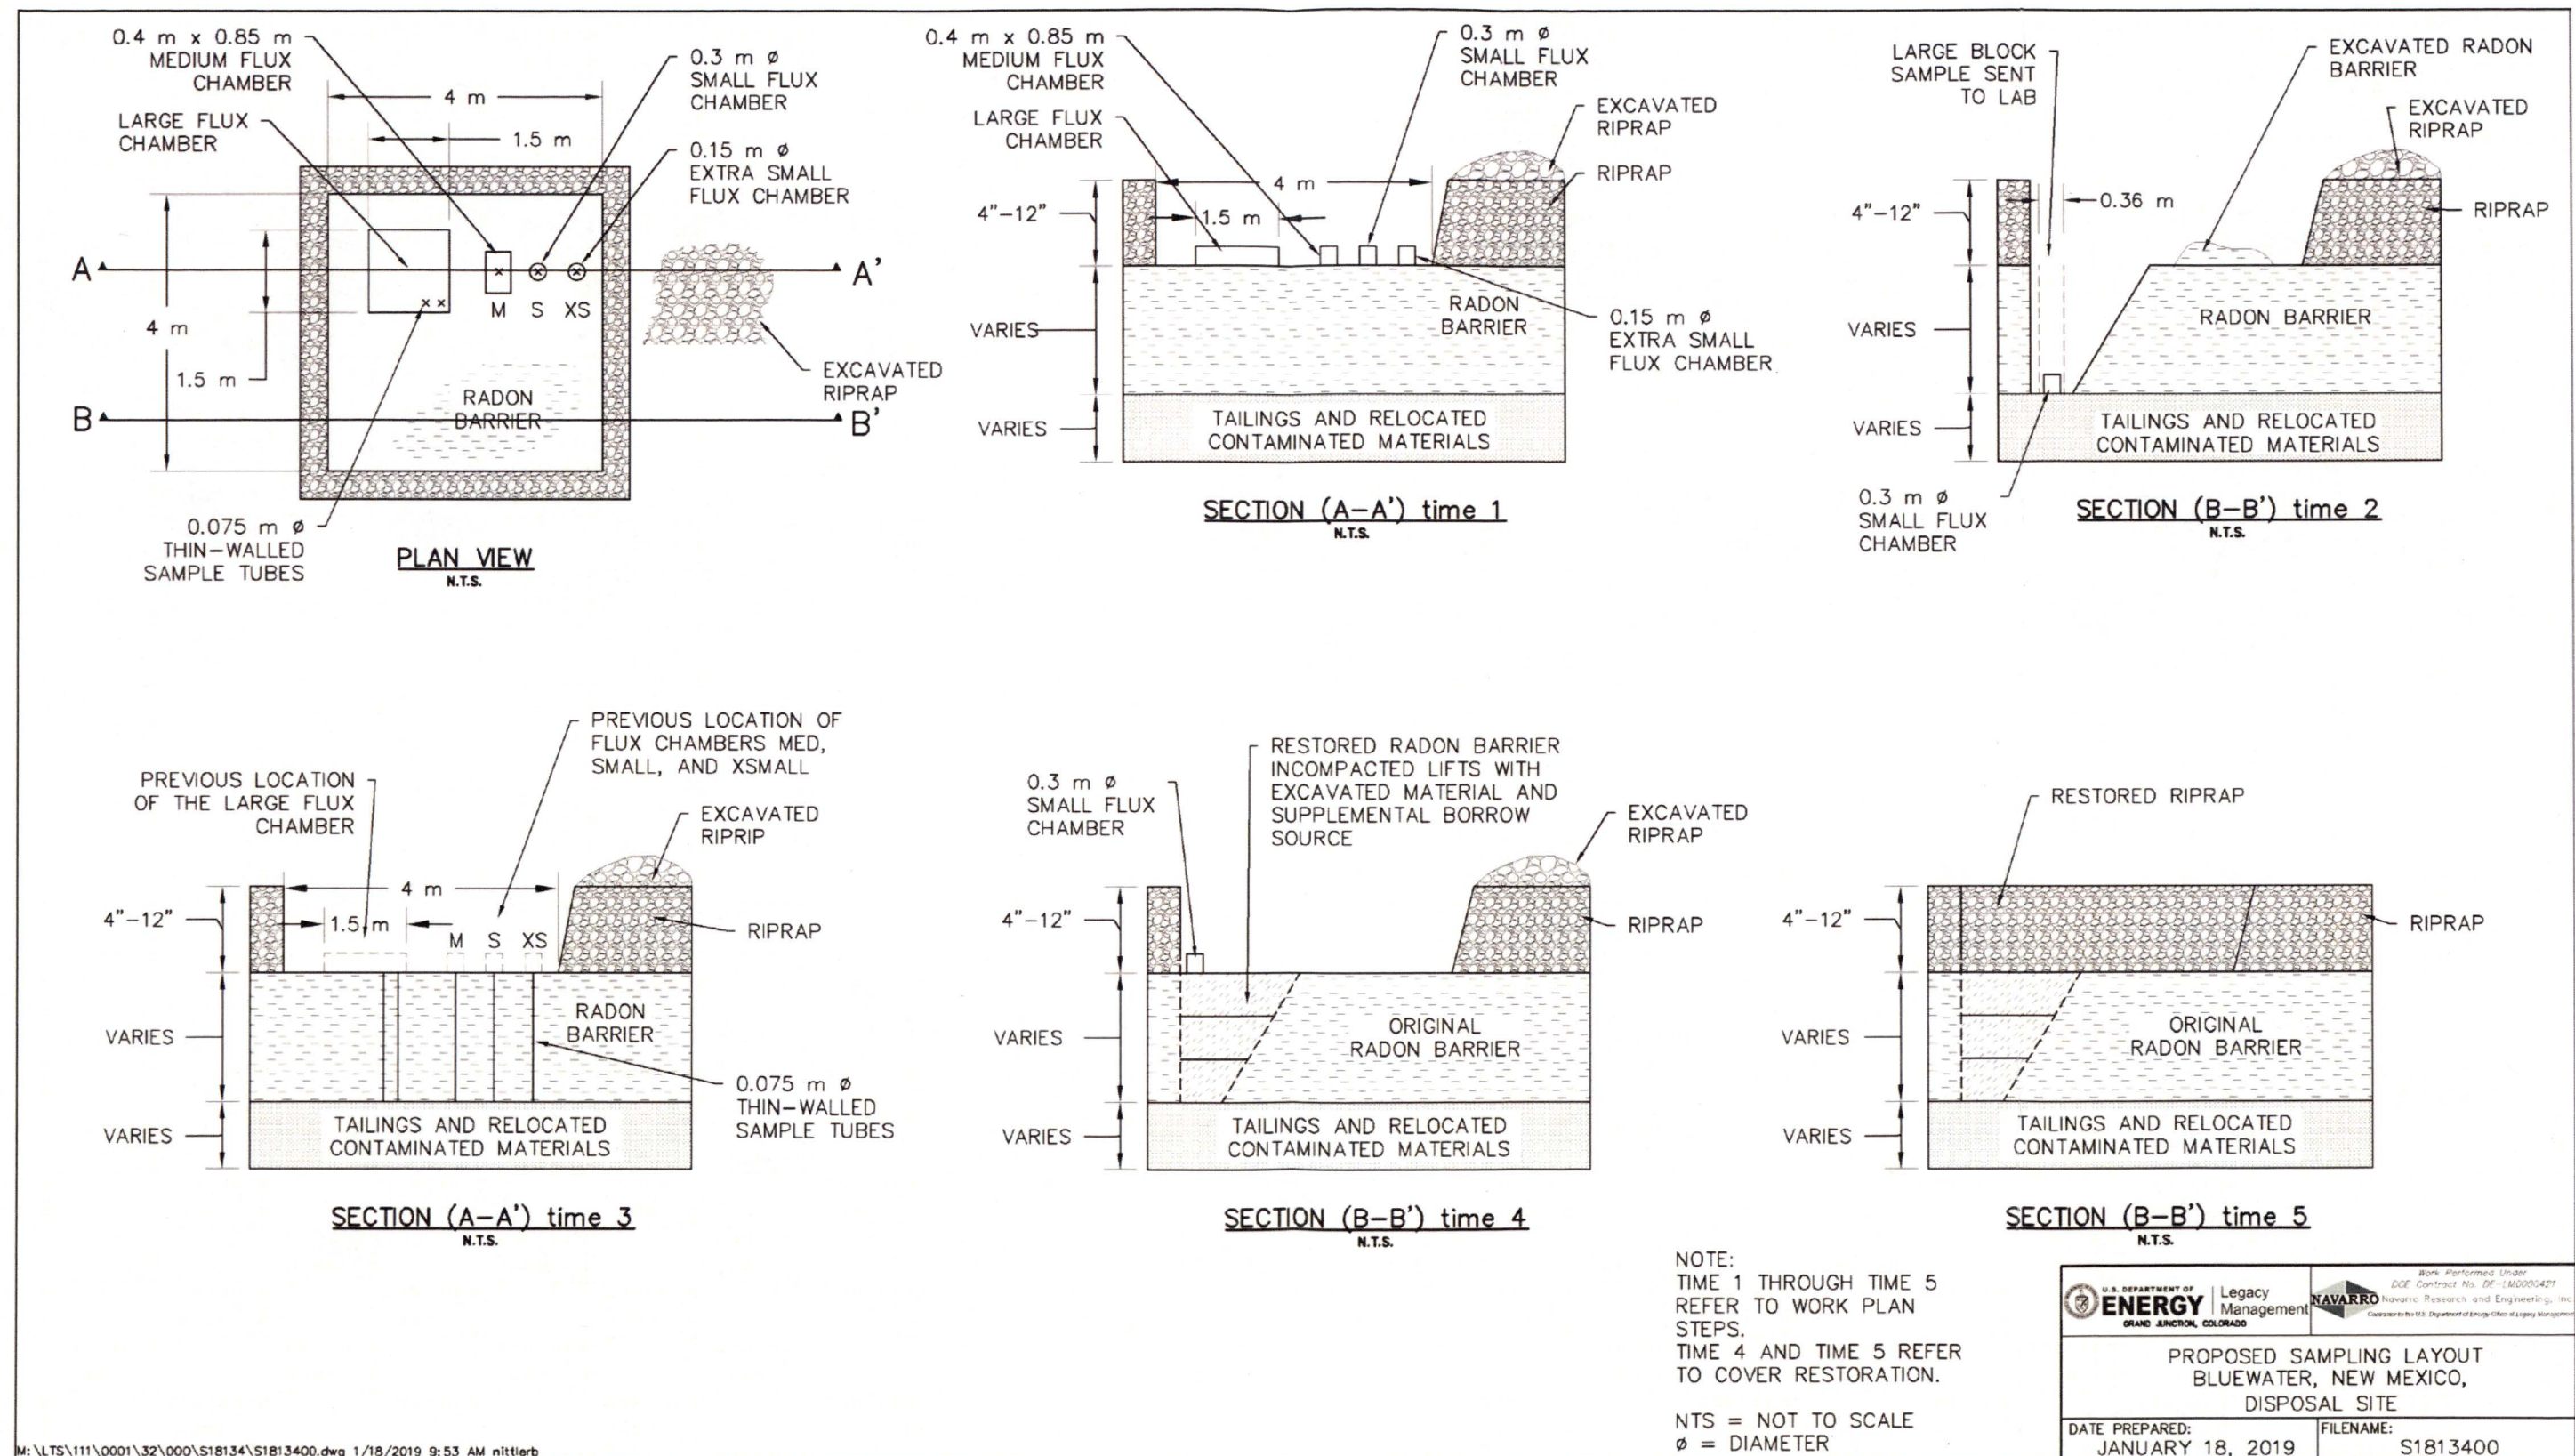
Proposed Sampling Layout, Bluewater, New Mexico, Disposal Site
